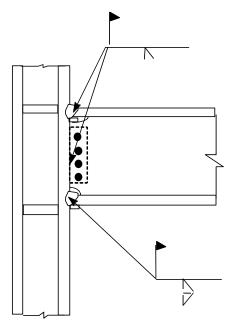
Typical Bolted Web, Welded Flange Connection
